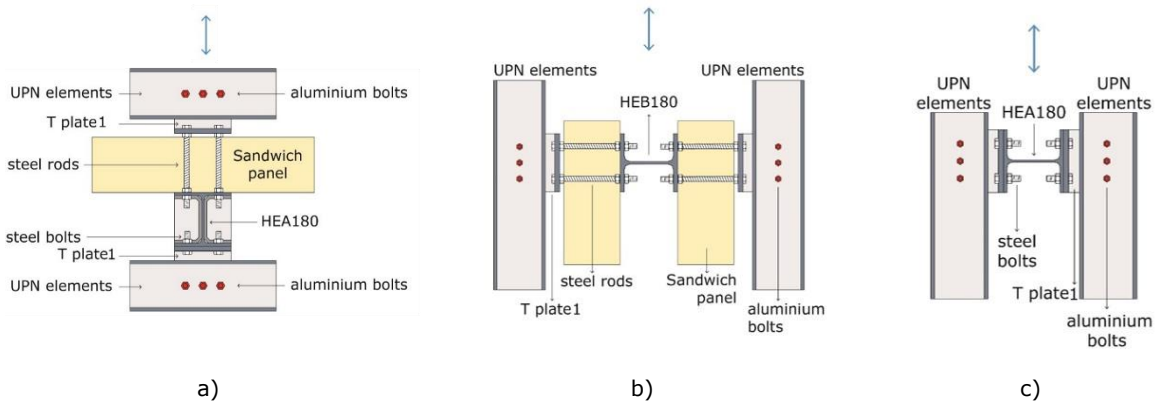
Images of a) Detail 3.1, b) Detail 4 and c) Detail 5.
